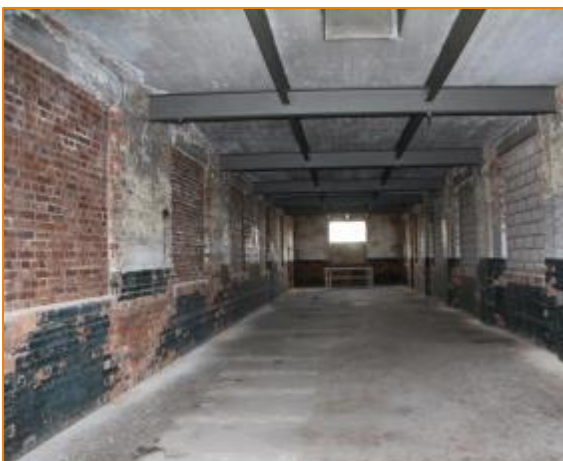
View from inside the first floor switchroom prior to FCL installation
